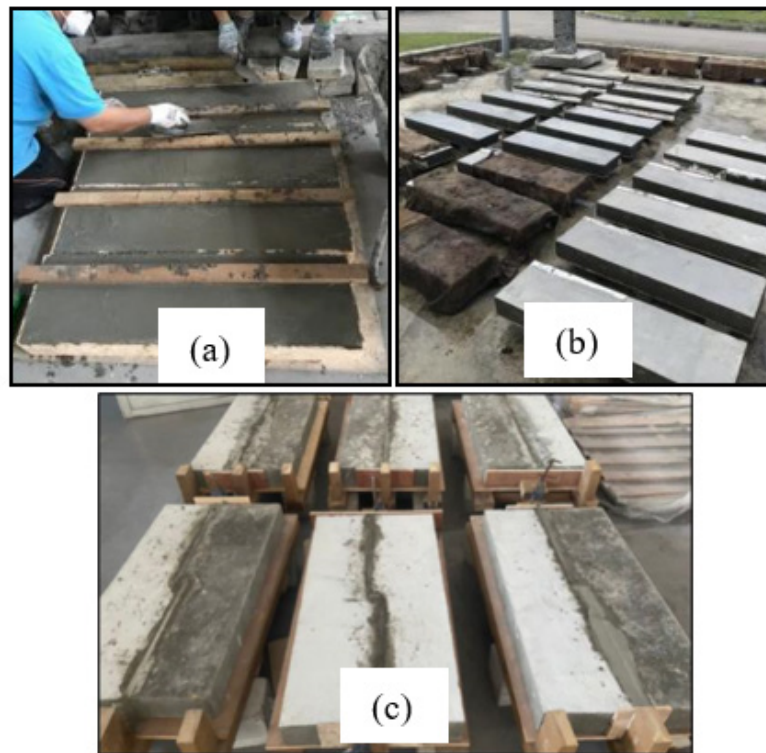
Wall samples. (a) Casting, (b) Curing, (c) Grouting for connection
